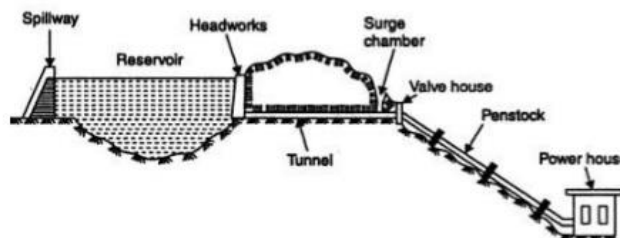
High head power plant layout. The main dam, spillway, and powerhouse stand at widely separated locations. Water flows from the reservoir through a tunnel and penstocks to the turbines.
